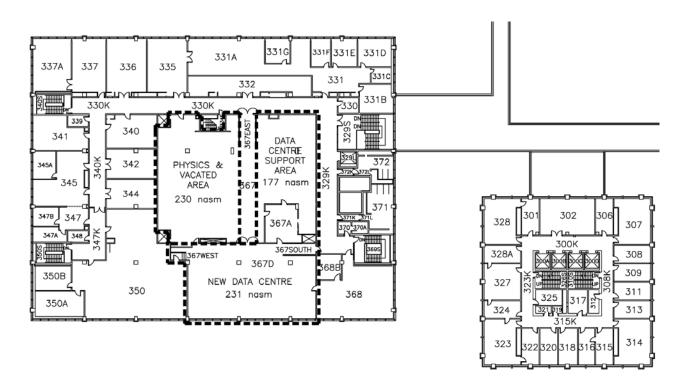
McLennan Physics Building, Proposed Third Floor Plan
